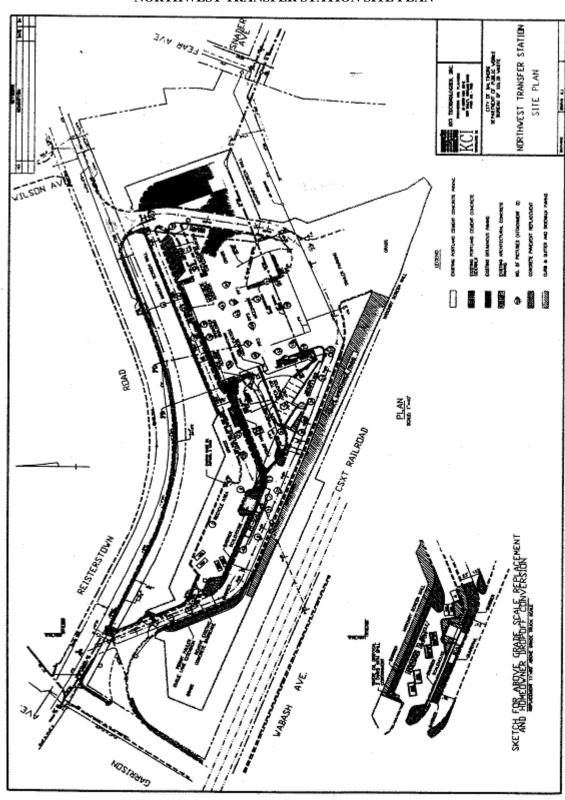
NORTHWEST TRANSFER STATION SITE PLAN
